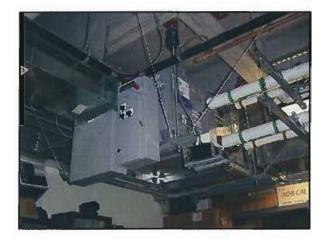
DVC Library Building, New Fan Coil Unit FC 1-1 Serving the New Addition on the First Floor
